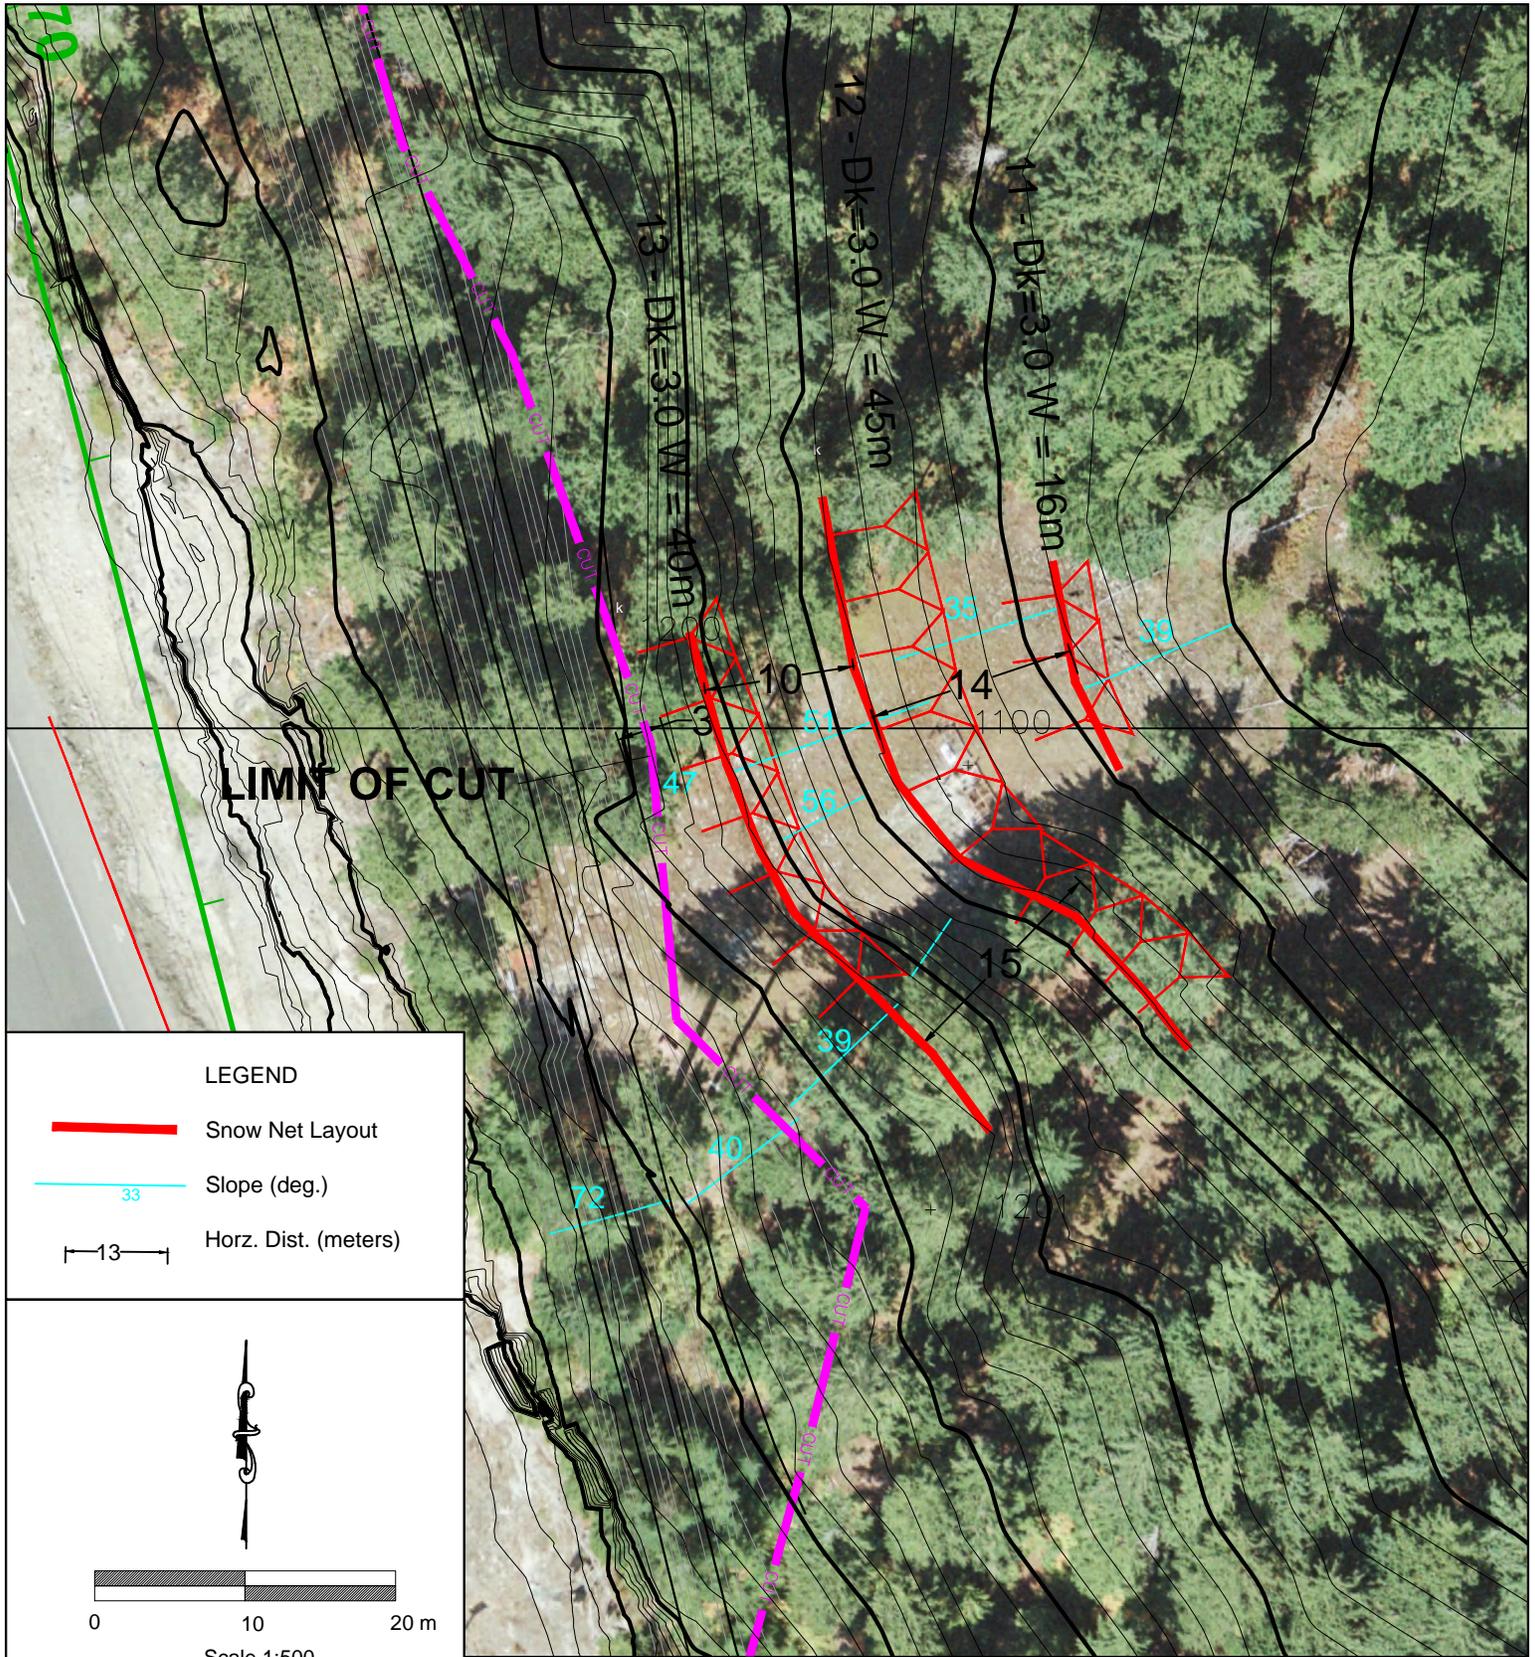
shows the Preliminary Layout for Structures in the starting zone of Bald Knob. Tables 9 and 10 present a summary of the Bald Knob layout. The preliminary coordinates for the structures, including end points, are presented in Appendix A.
